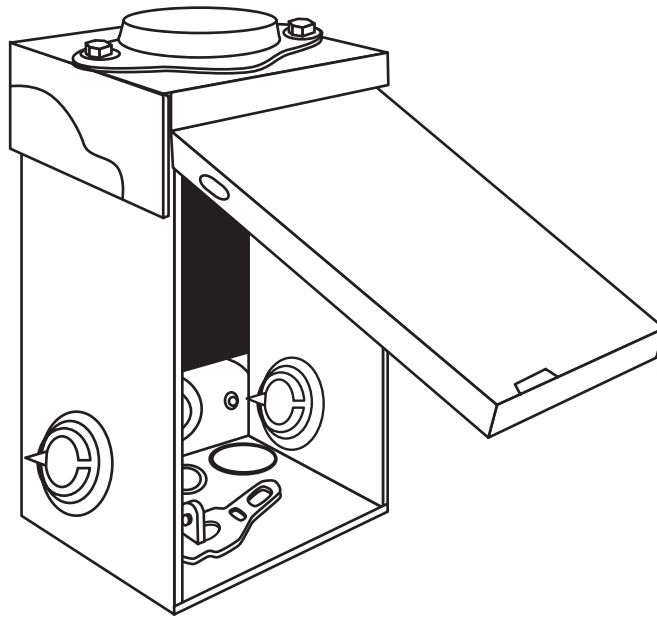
Weatherproof box (driptight) for outdoor wiring.
